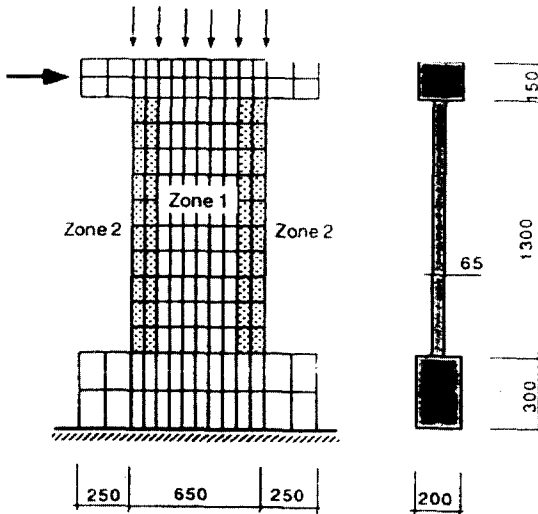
Finite element model of reinforced concrete shear wall tested by Lefas et al.(1990)
